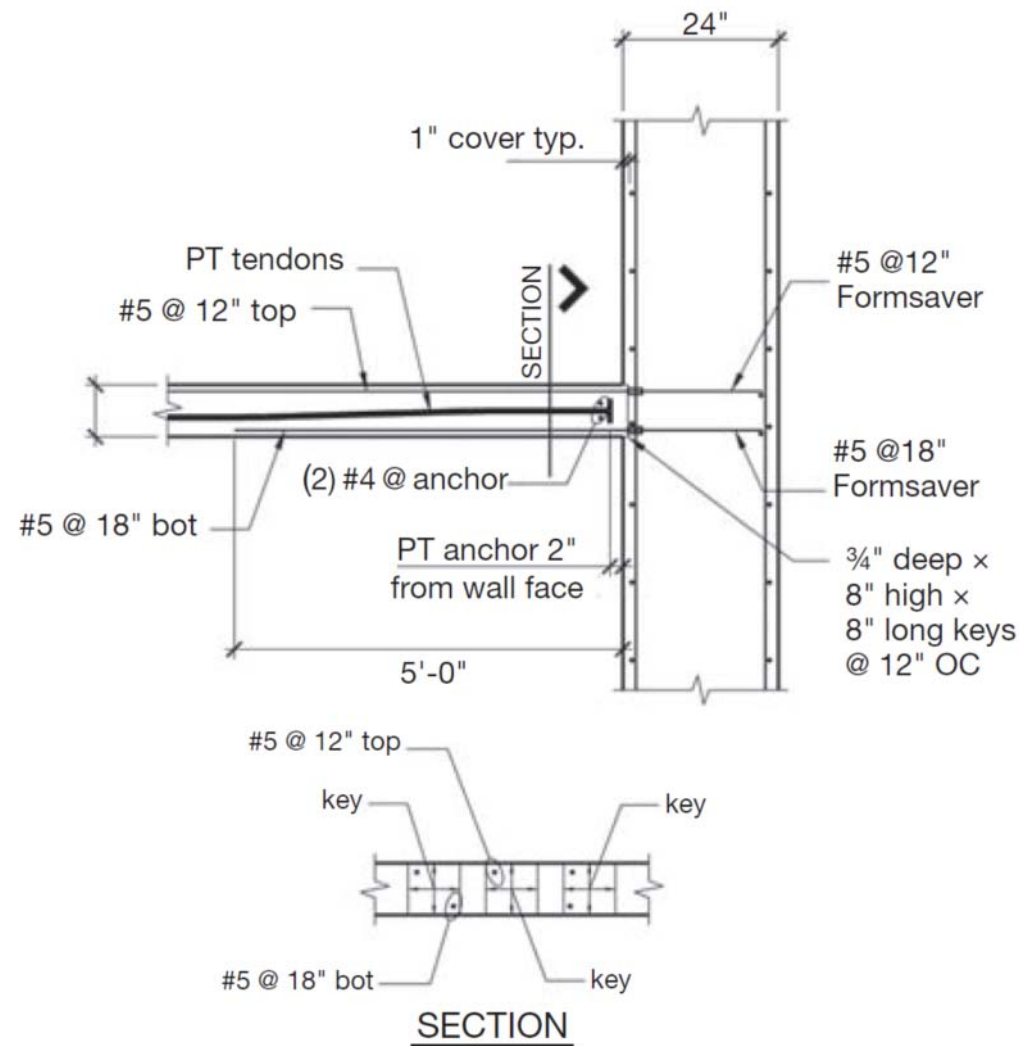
Typical Slab-Wall Connection and Detail for Specimen 1
